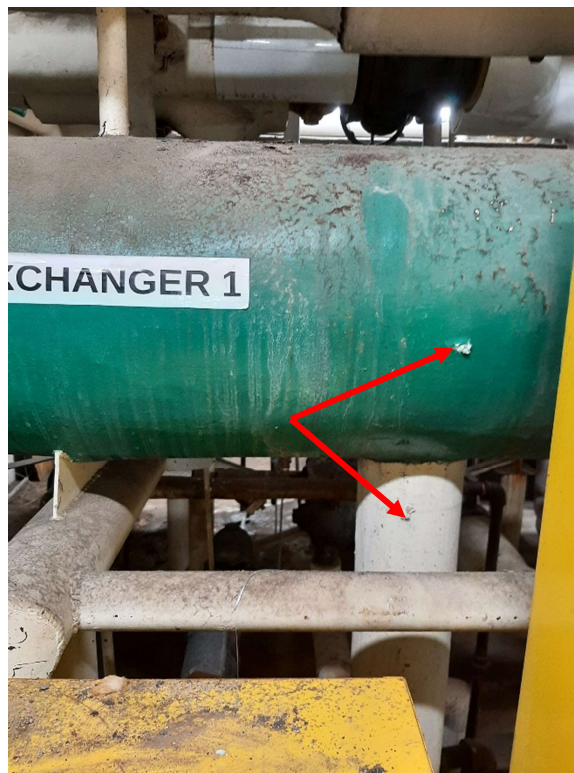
Pipe straights throughout the primary boiler room were observed to be comprised of fiberglass.
